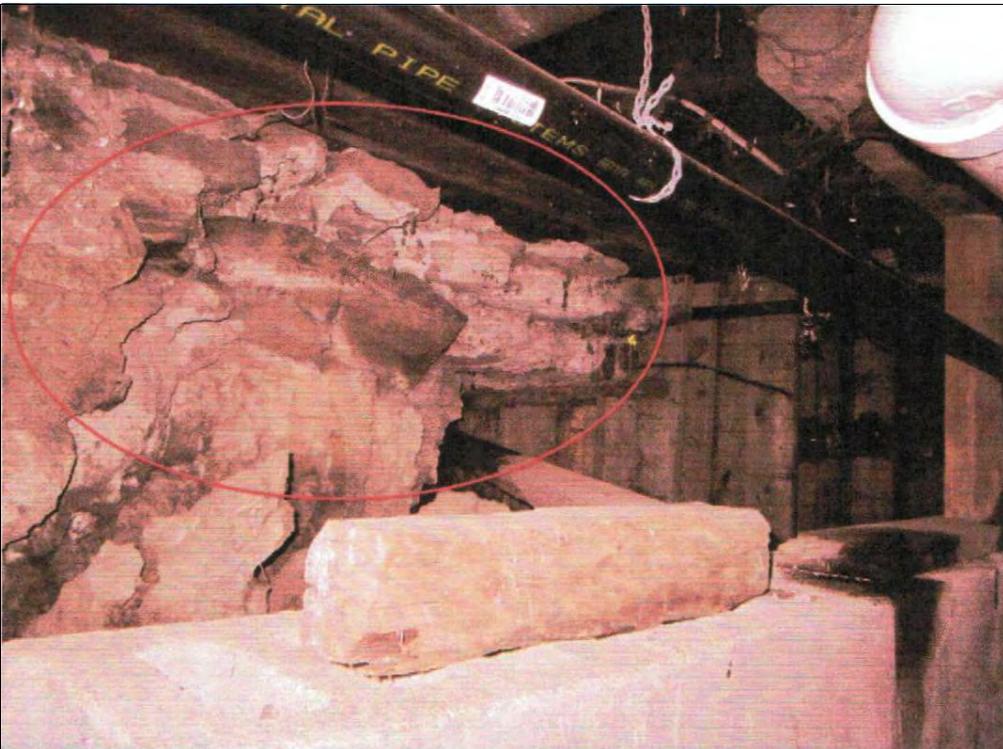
old foundation is in complete ruin and unstable; temporary foundation has been erected to attempt to provide stability.
